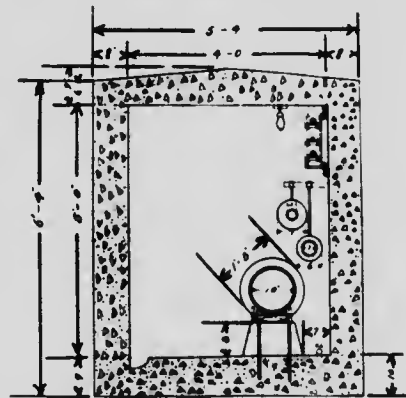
SECTION OF TUNNEL CONNECTING KNOX COLLEGE WITH CONVOCATION HALL.
